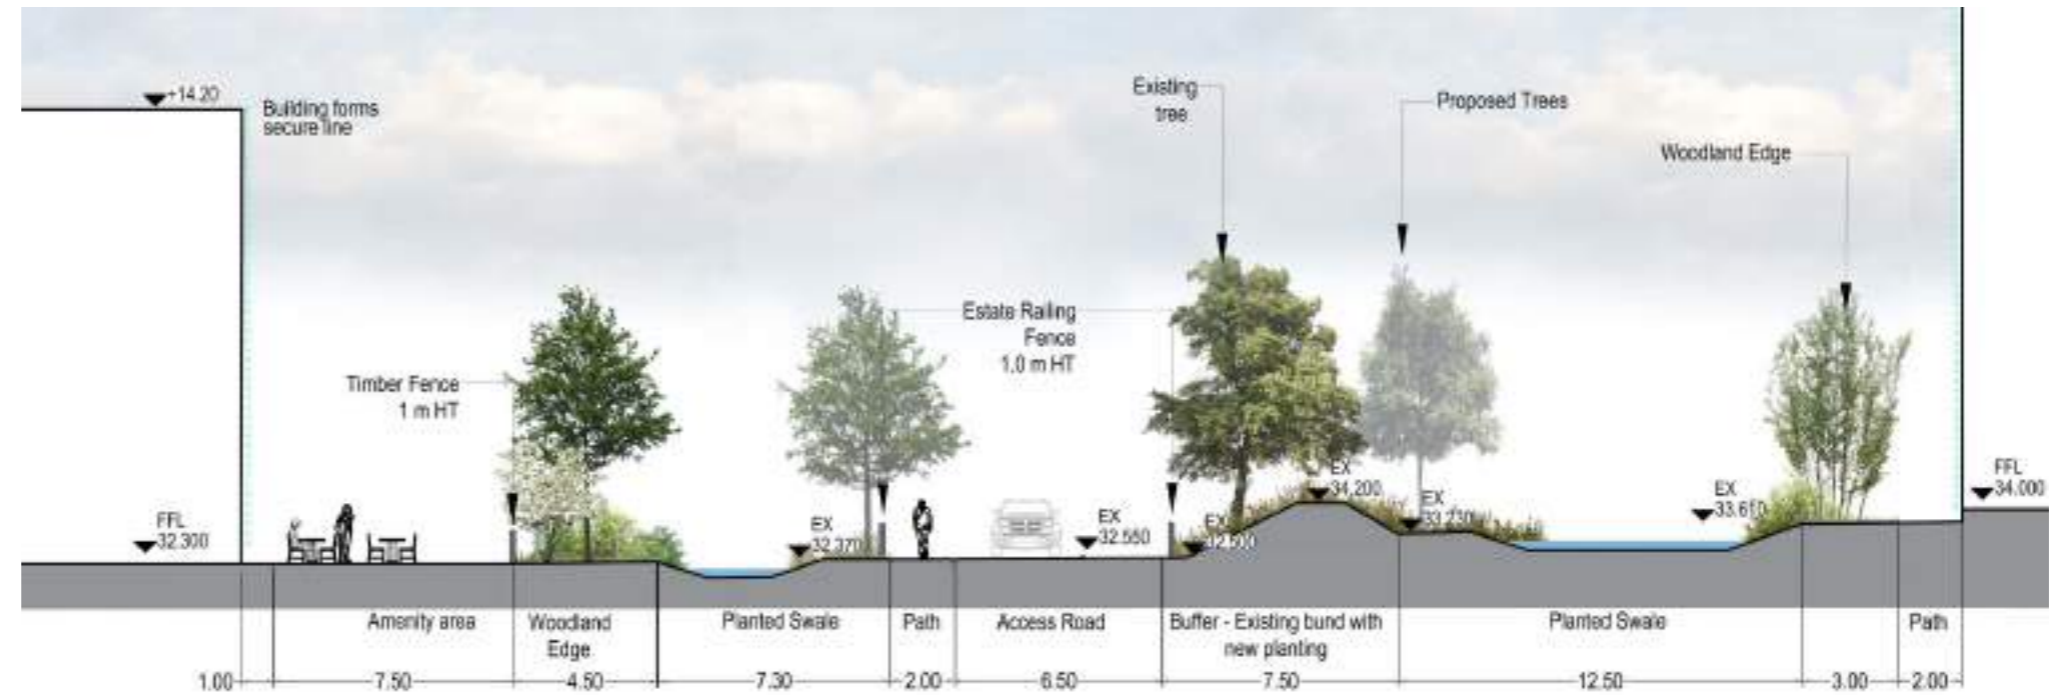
Section U-U through HQ spaces and the drive to Westhorpe House
